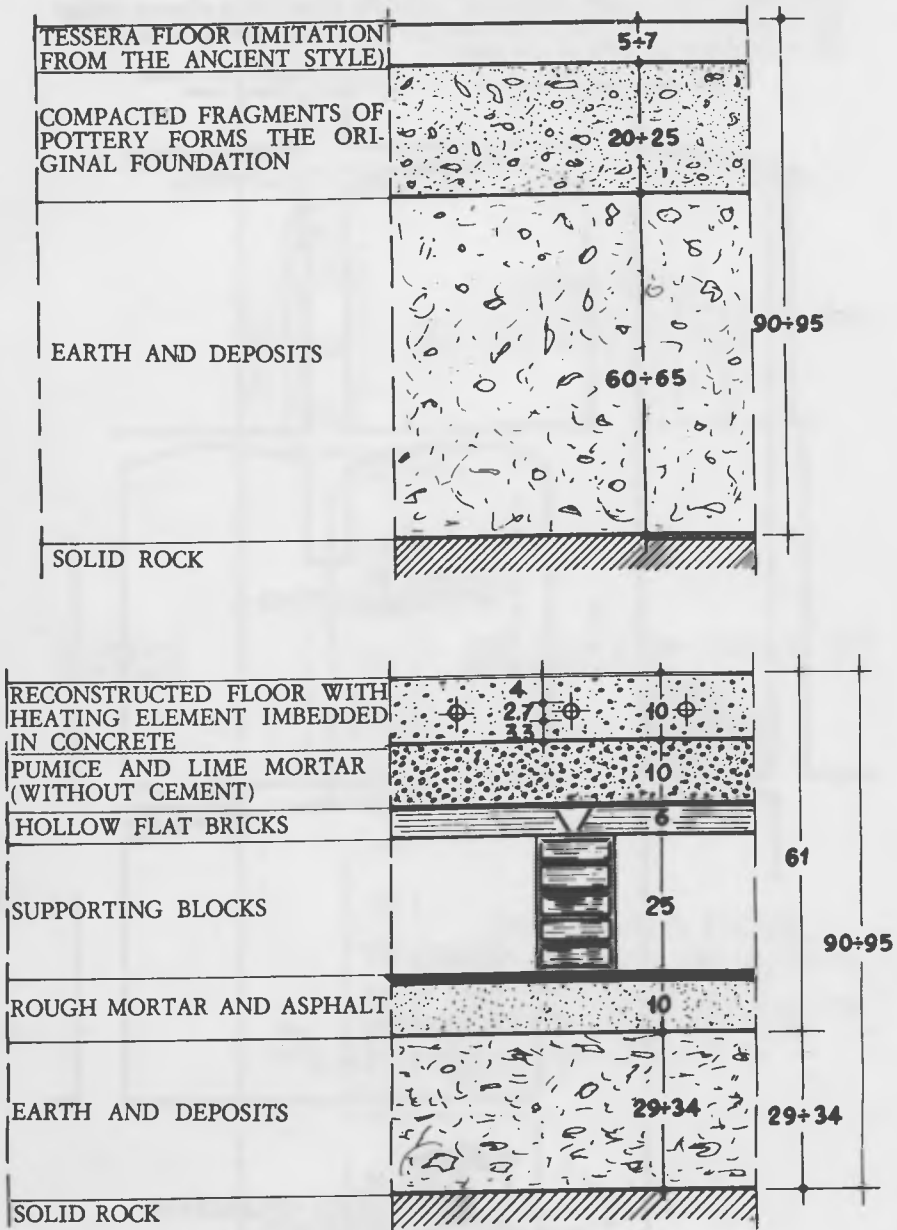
The old massive thermal floor (section shown on the top of the page) was taken away and a new floor was built having an air cavity and pumice structure (section shown above).
